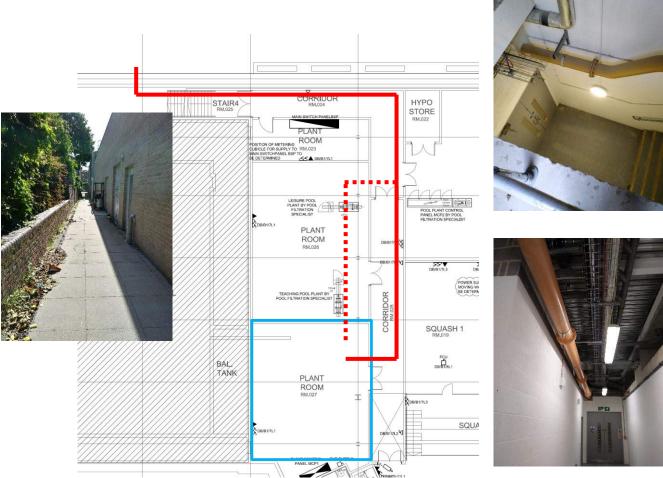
(clockwise from the top) Gas pipe routing – Gas pipe routing – Proposed DH pipe routing – External view of the connection point
